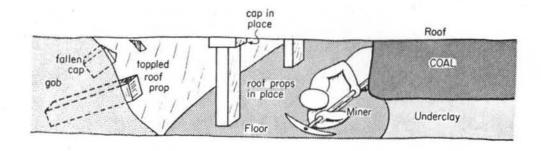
Detail of longwall and modified longwall advancing extraction methods at the working face of underground mines.
